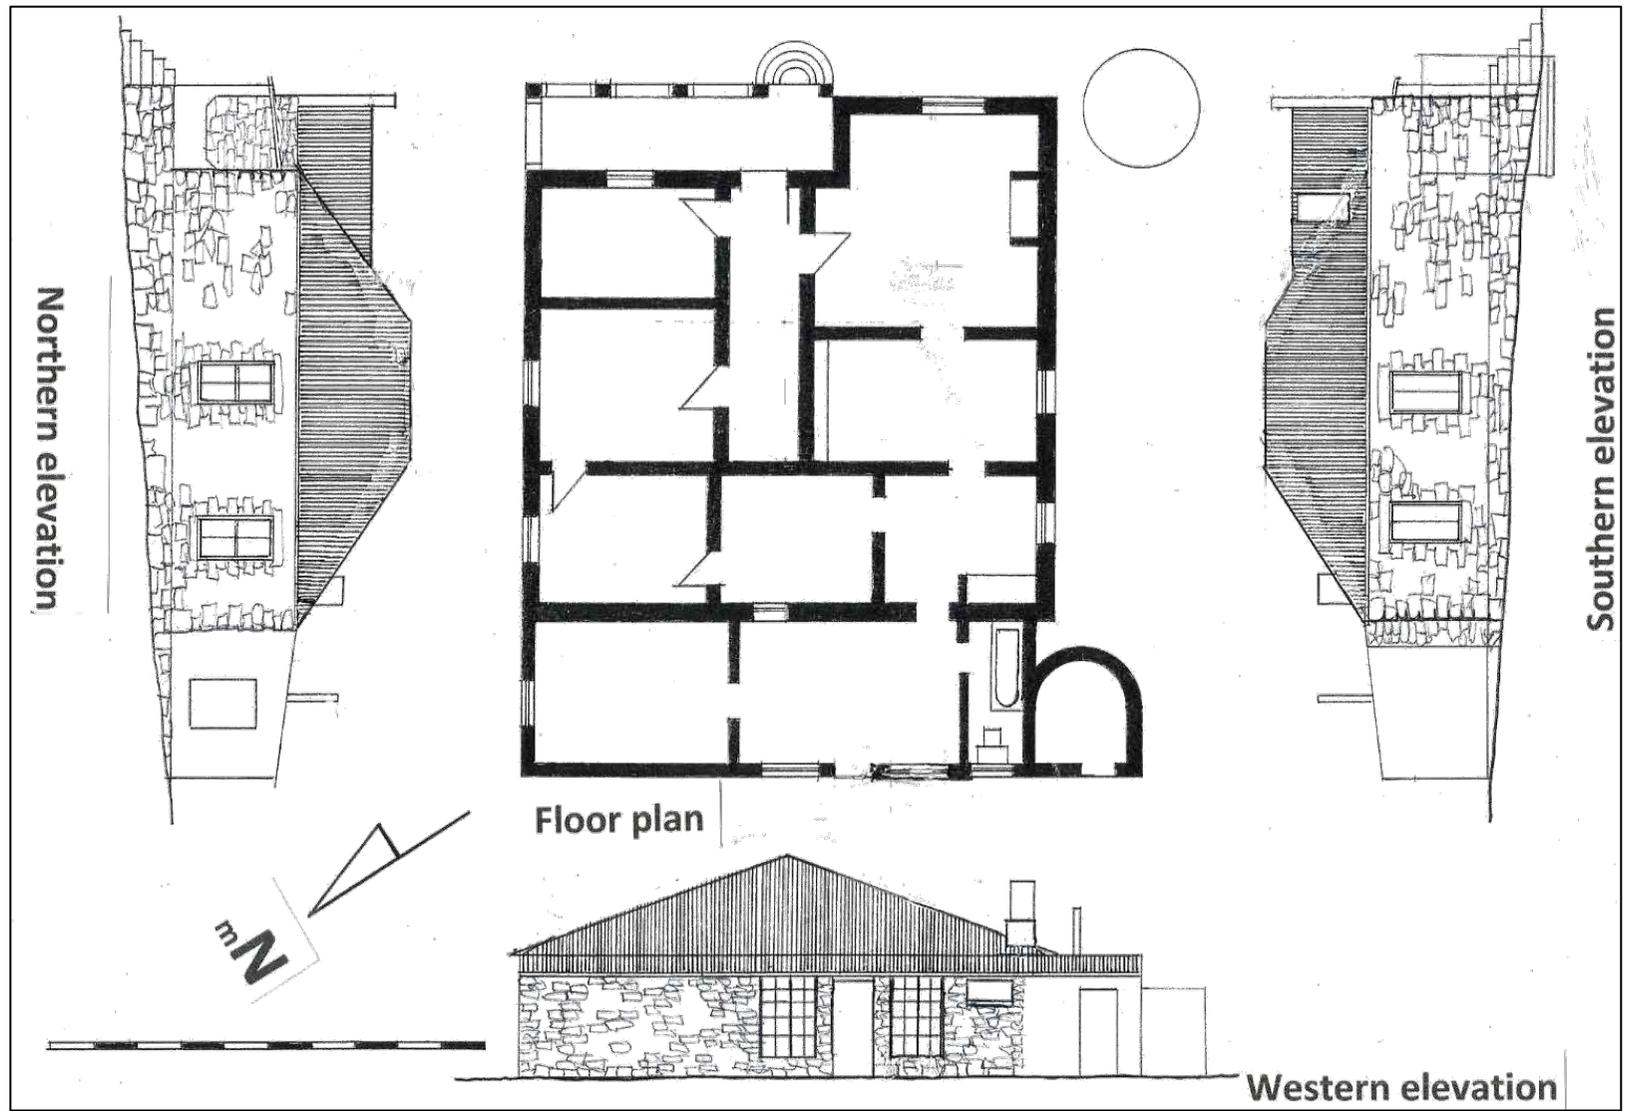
A floor plan of the original dwelling with the northern, southern and western elevation. It appeared in the recording report of Mauritz Naudé (2016:3).
